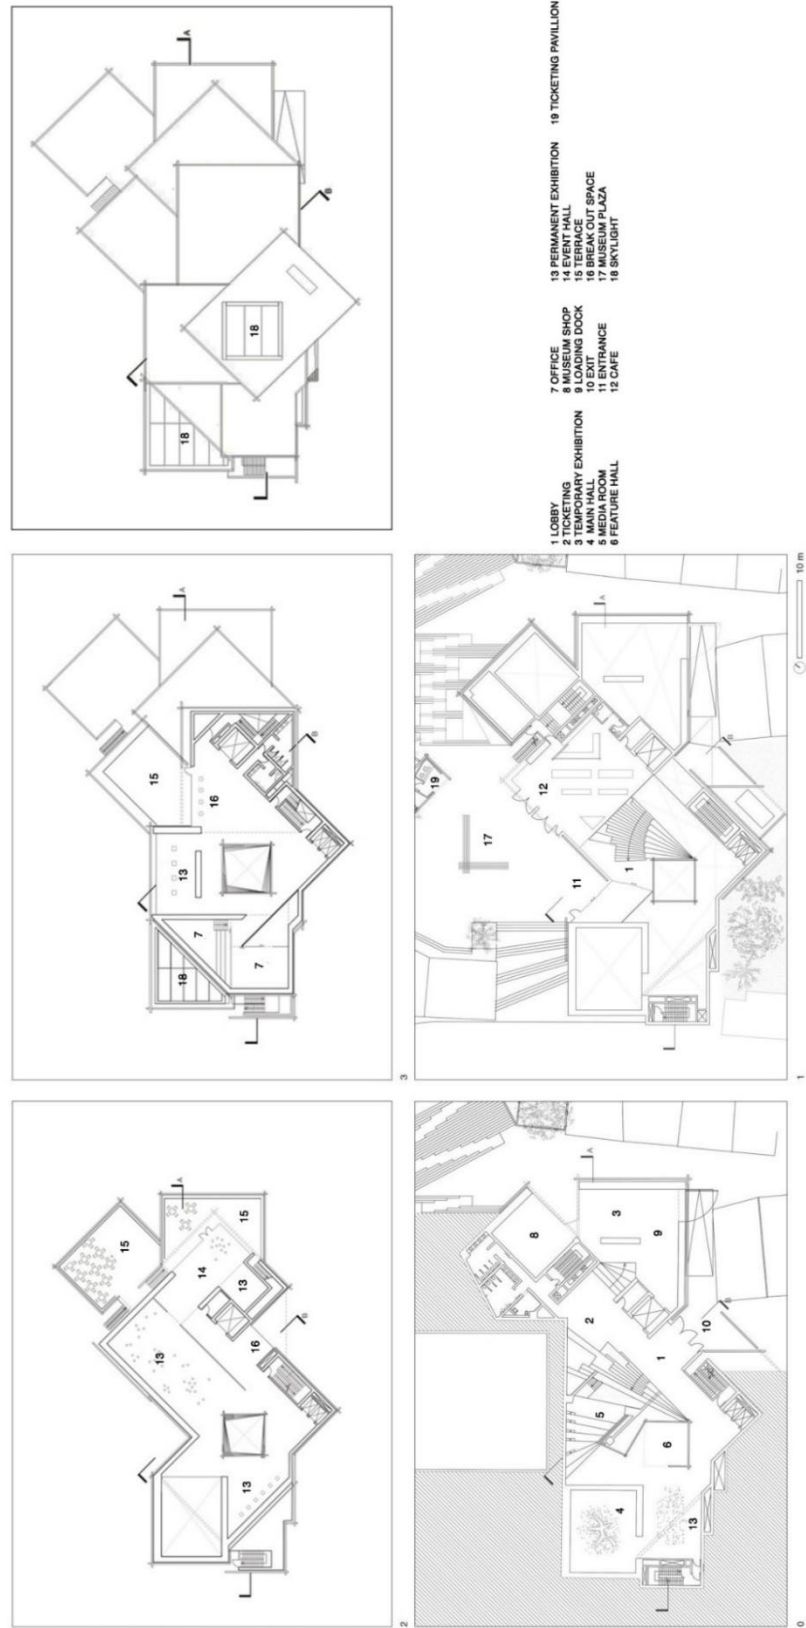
Floor Plans of OMM (Source www.archdaily.com)
